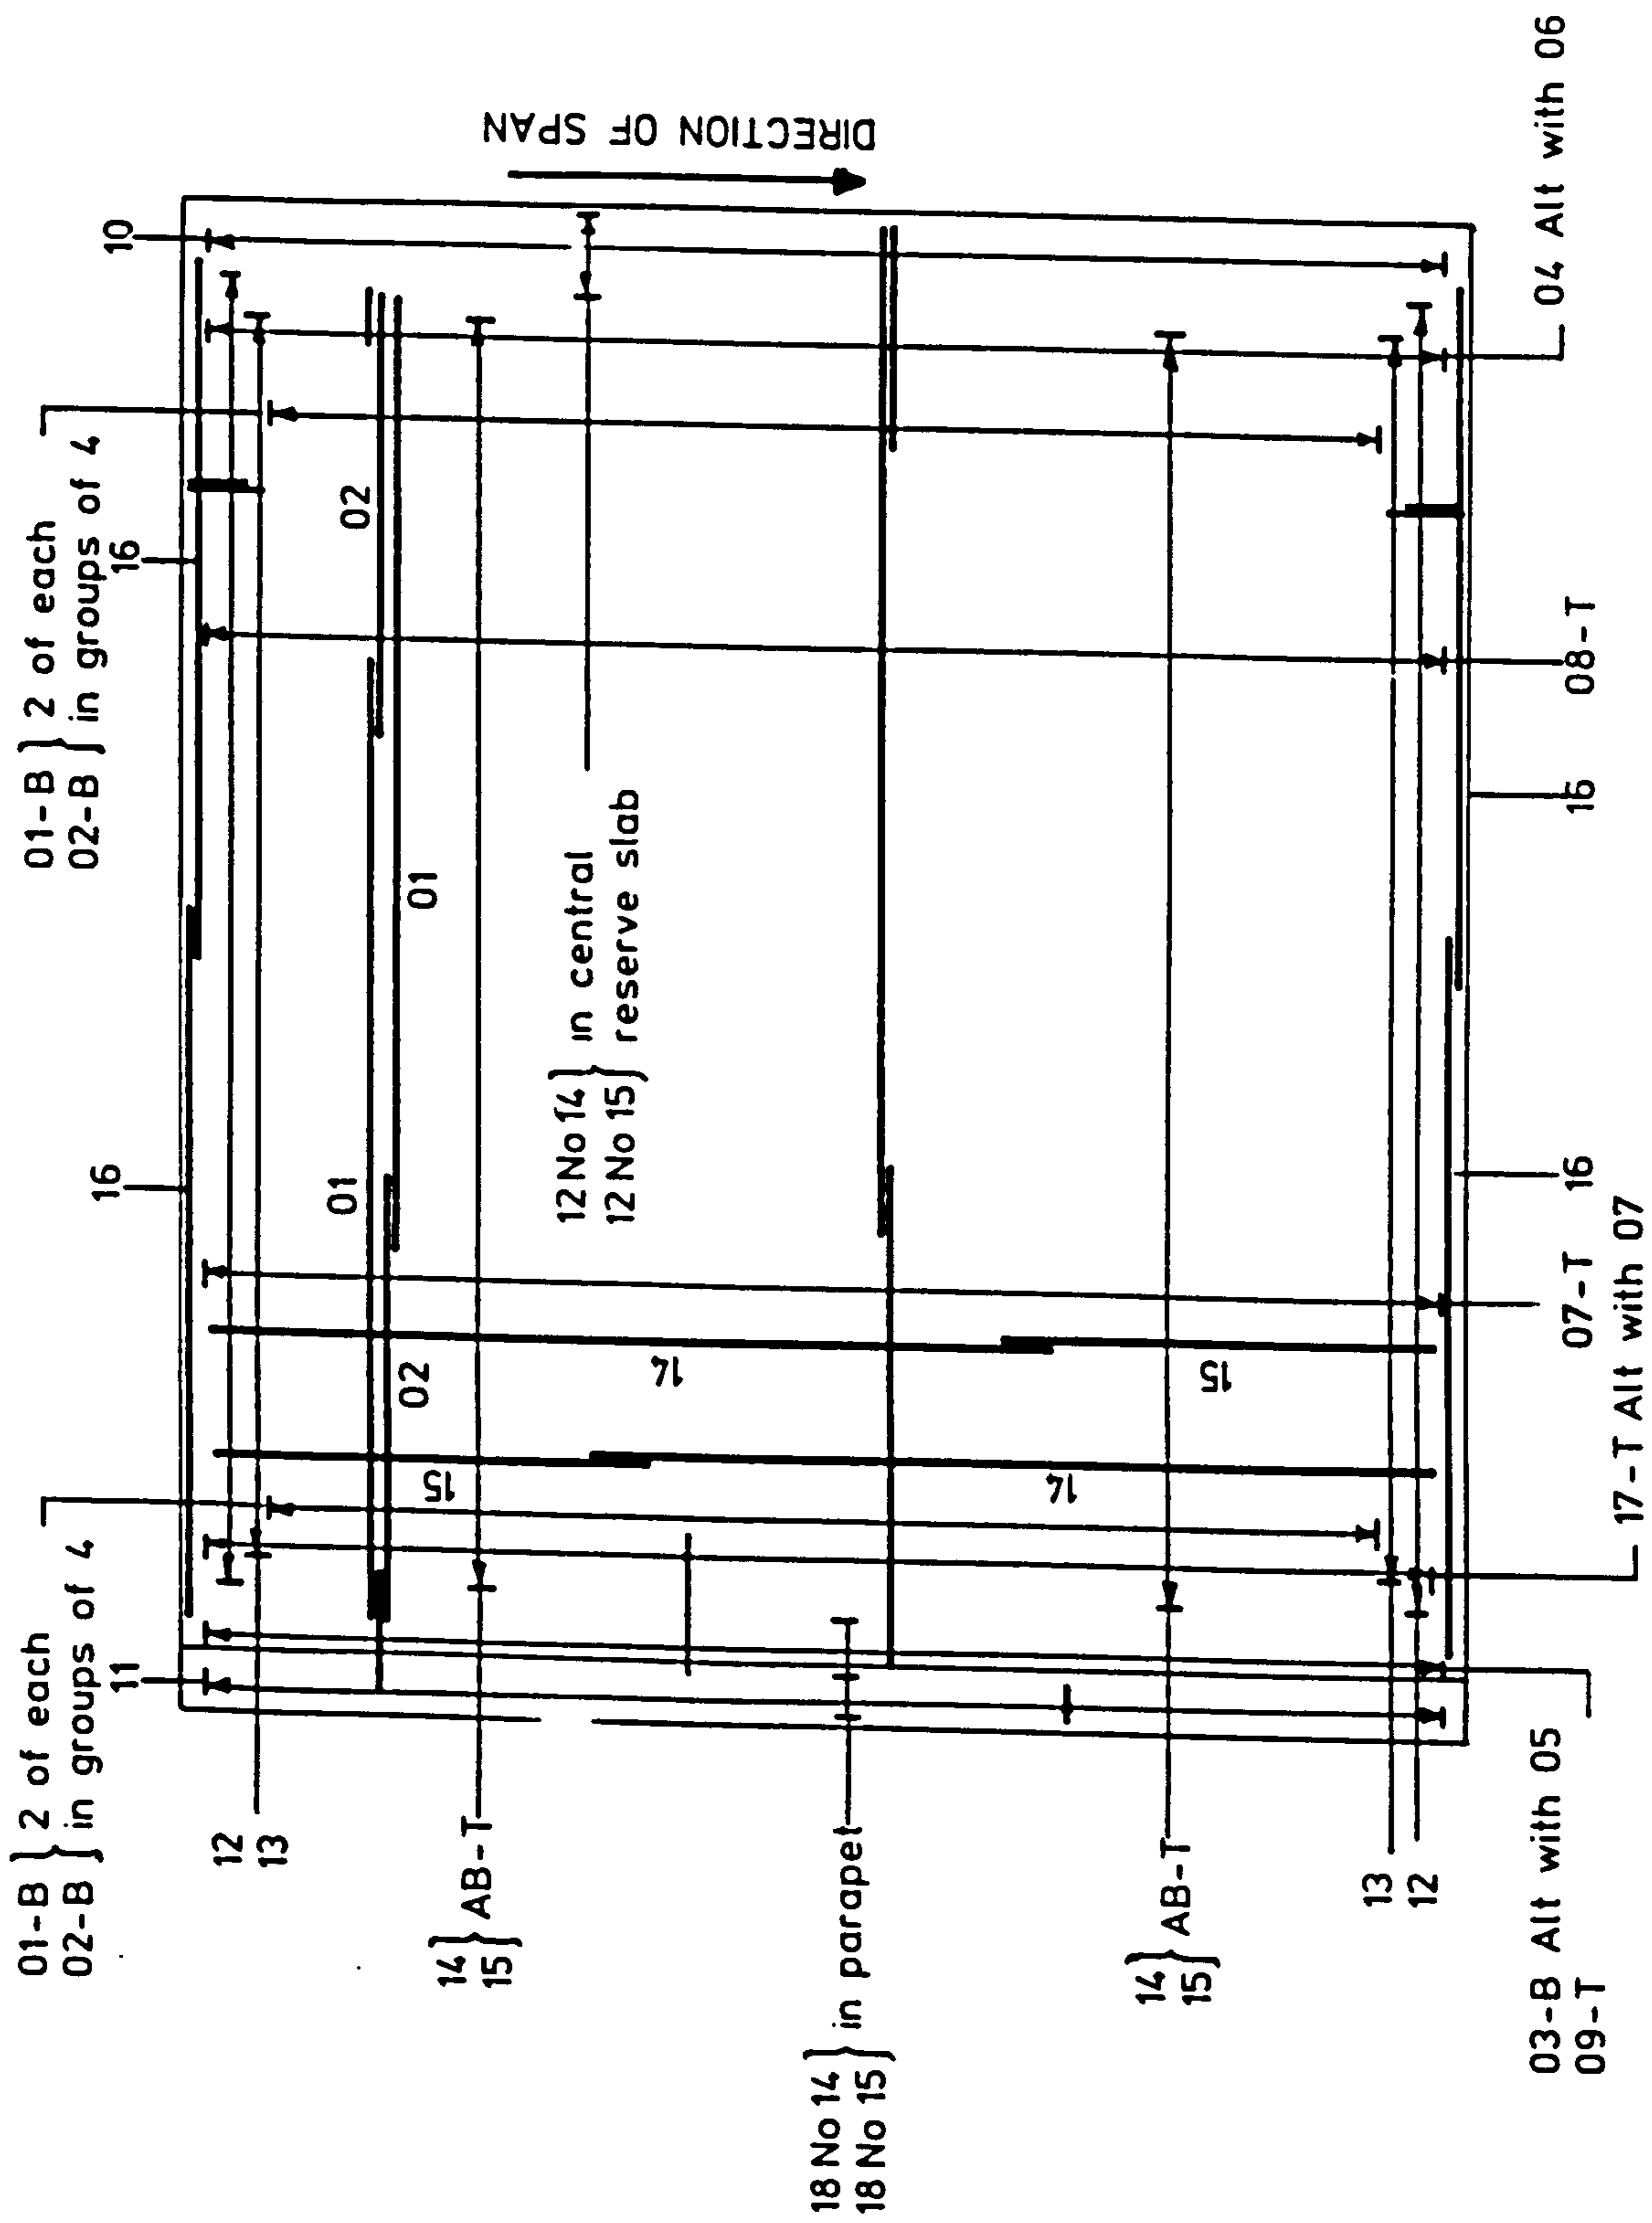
REINFORCEMENT LAYOUT FOR FULL SIZE DECK
